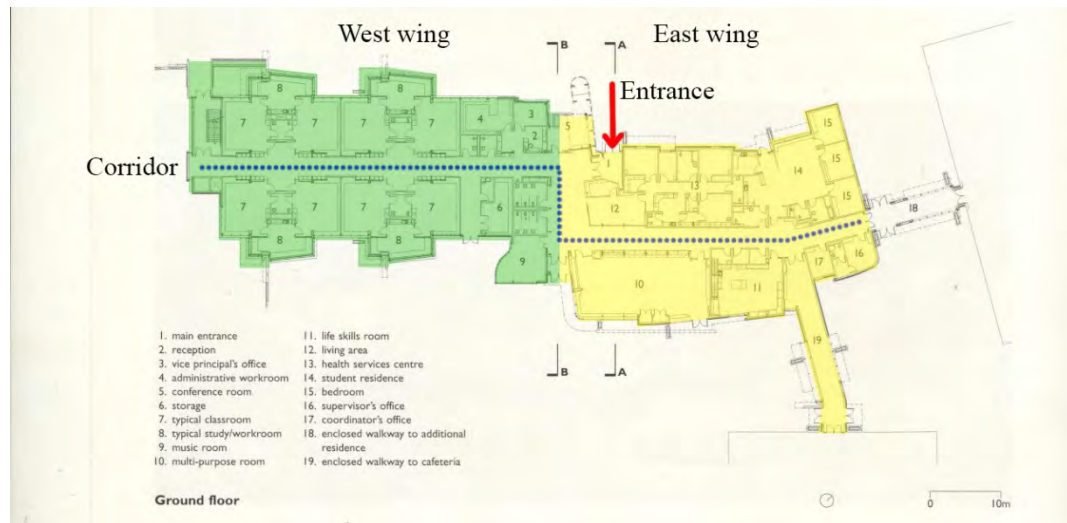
Ground floor plan indicating entrance, main corridor and east & west wing.
